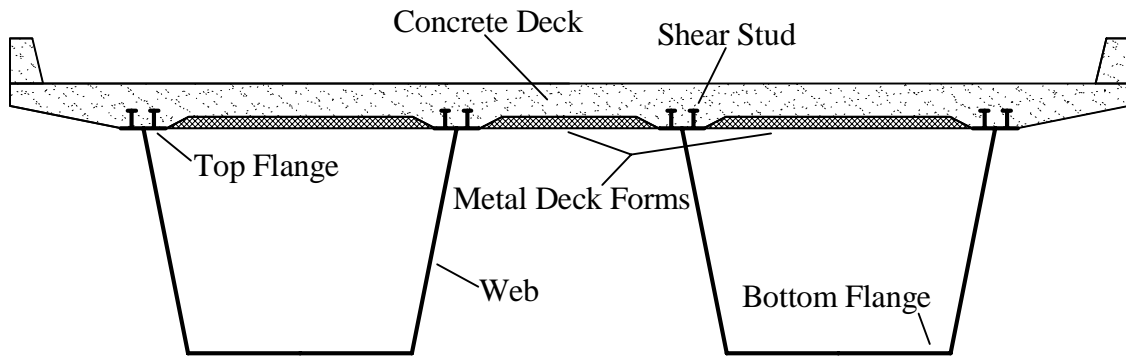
Typical Cross Section of Trapezoidal Box Girder System
